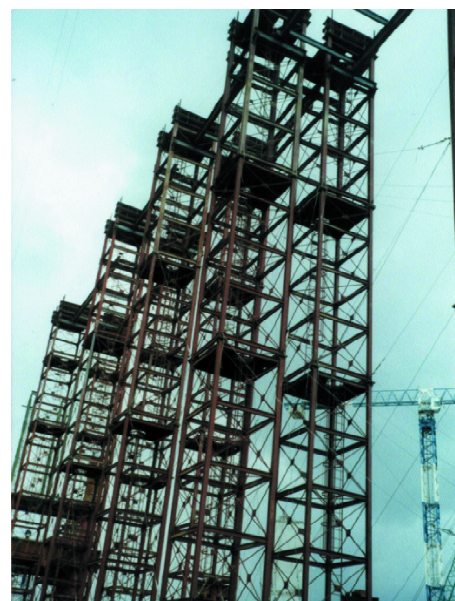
View of Temporary Steel Support for Spine Roof Erection
